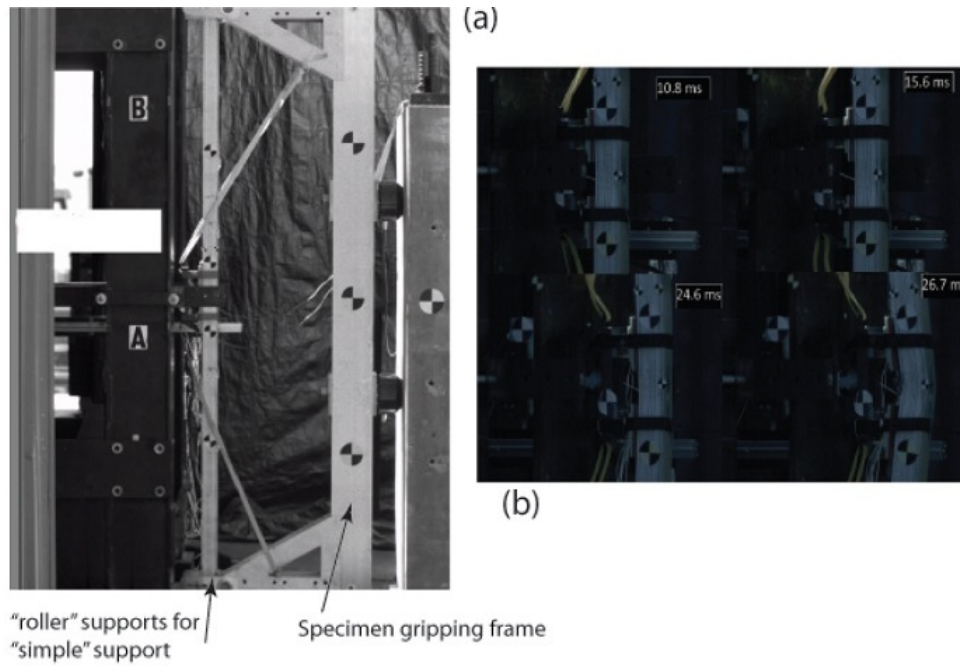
(a) Photo of Blast Simulator test configuration on long 7ft sandwich beams. (b) Four snapshots of beams under loading.
